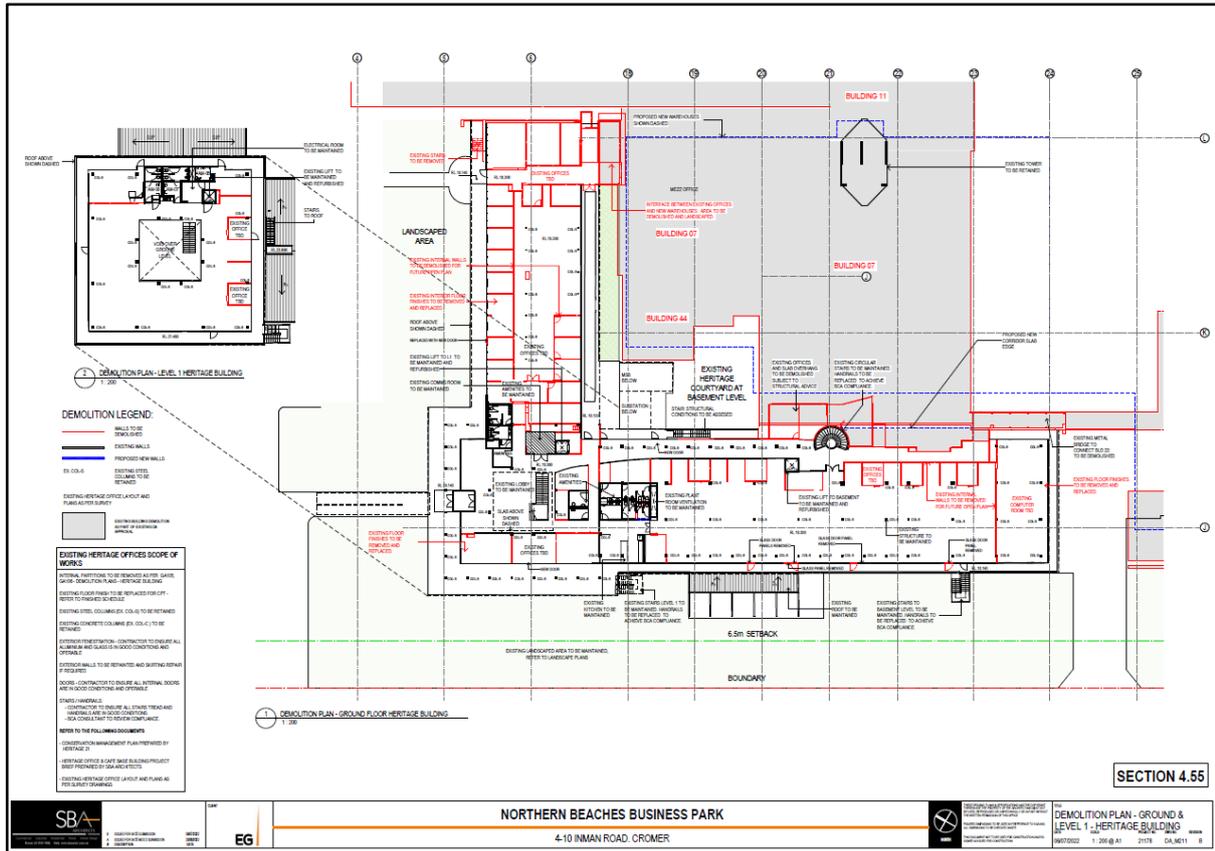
Demolition Plan – Ground & Level 1 Heritage Building
